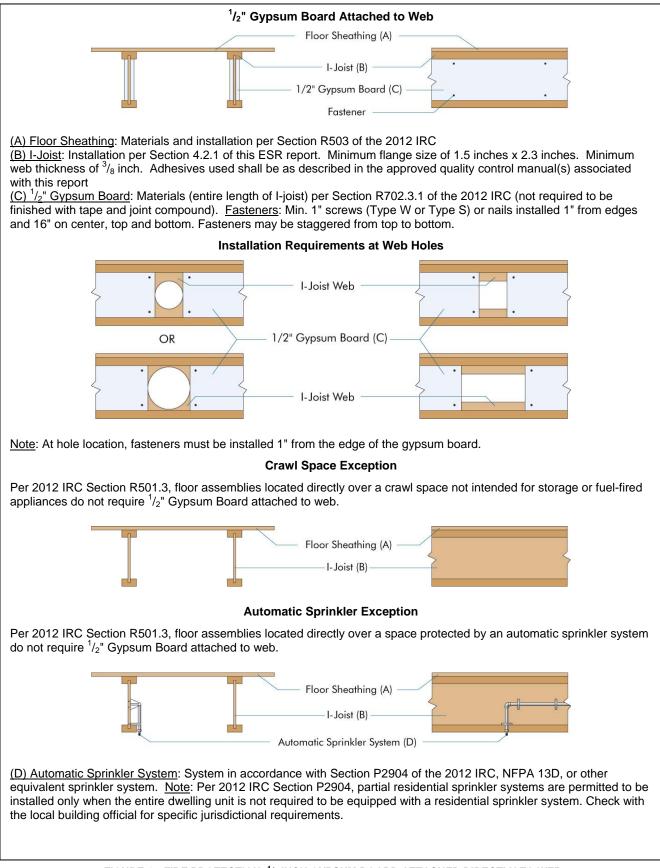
FIRE PROTECTION: ¹/₂-INCH GYPSUM BOARD ATTACHED DIRECTLY TO WEB
